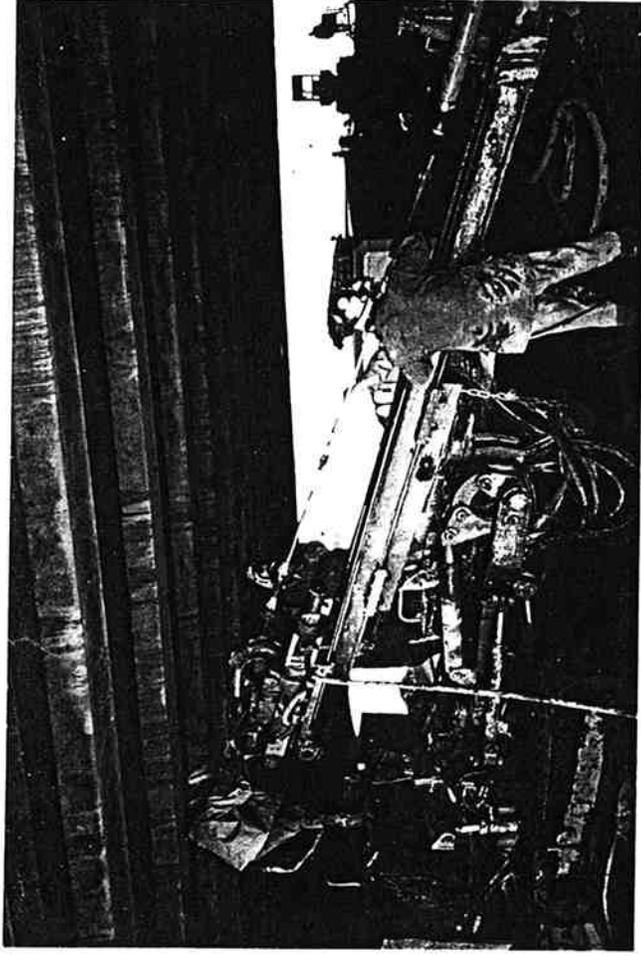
Placing an instrumented nail inside a cased drill hole at section 1
